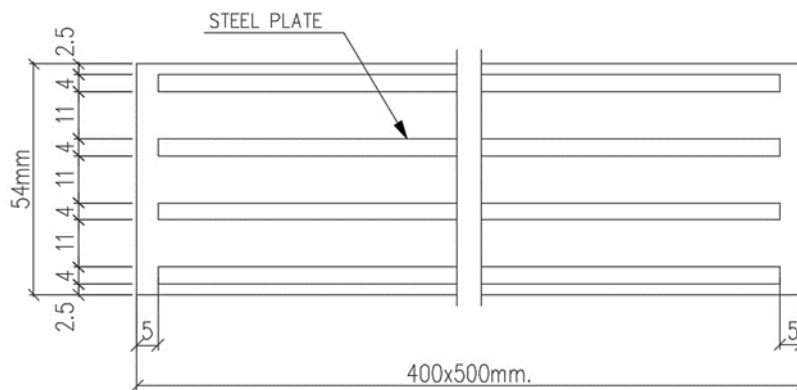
Elastomeric Expansion Bearing used in EBC10-REF Case (Cross-Sectional View)
